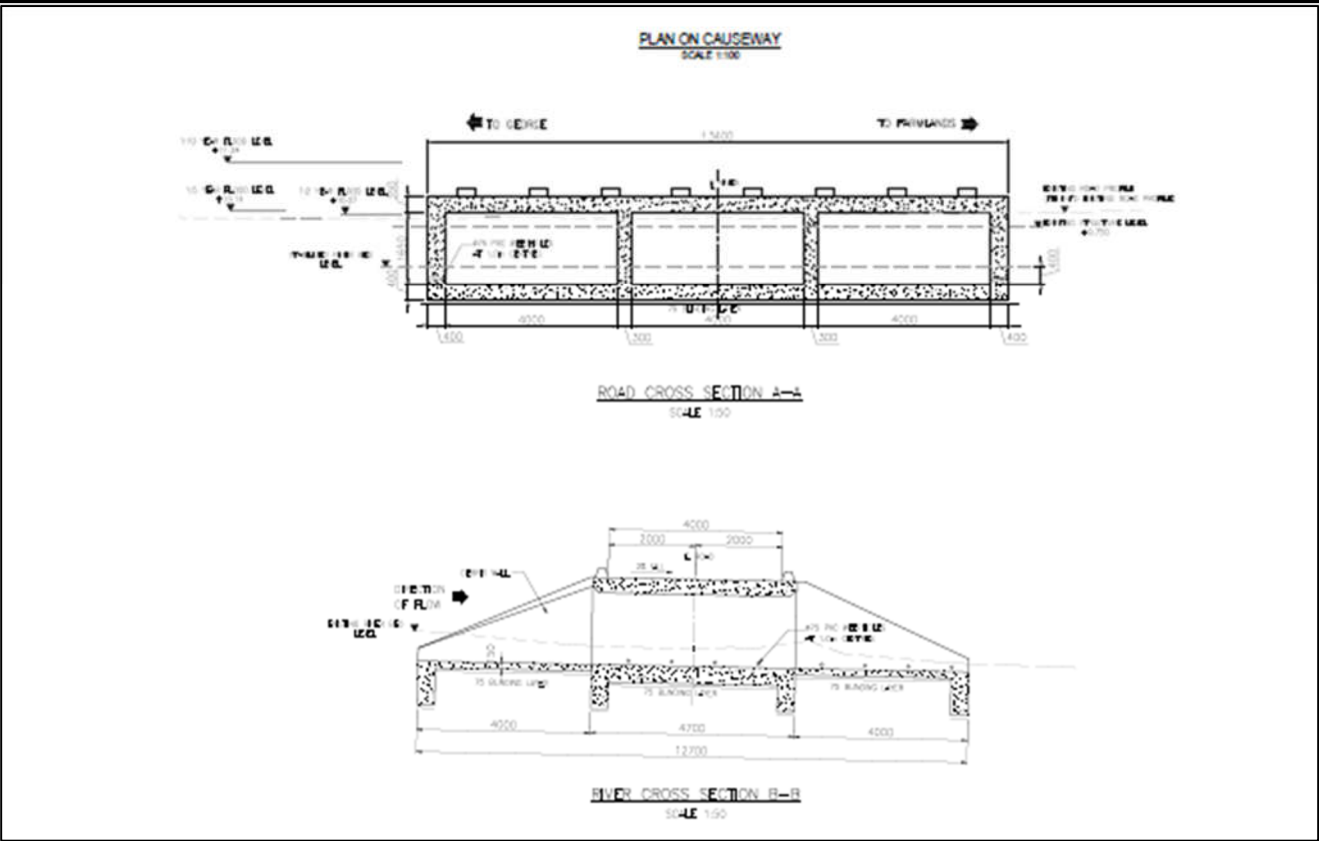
Cross-section of the proposed causeway construction along DR1791, (Hatch Engineering, 2025).
